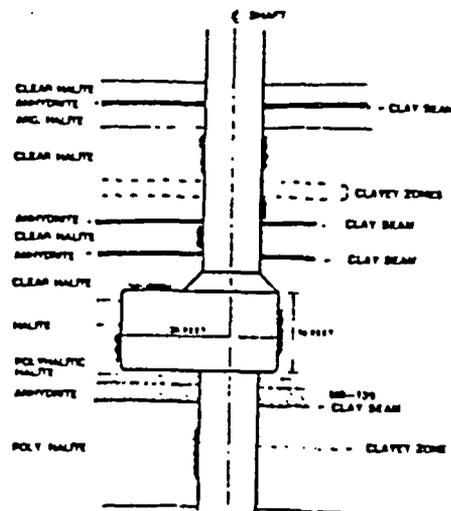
DISCONTINUITIES CAUSED BY CLAY SEAMS AROUND AN UNDERGROUND OPENING
